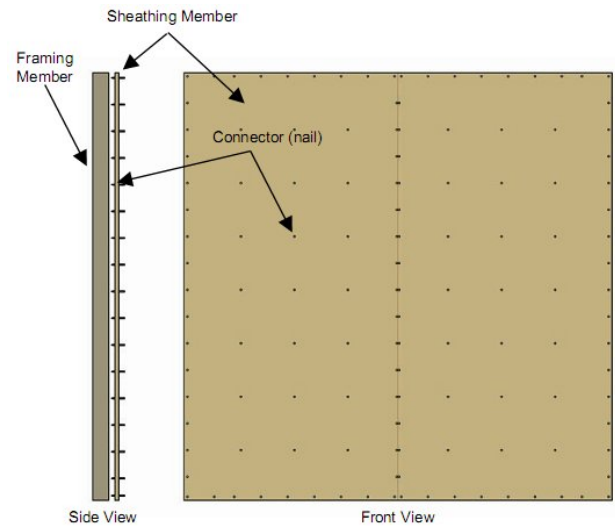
Components making up a wood shear wall in a light-frame wood building.
